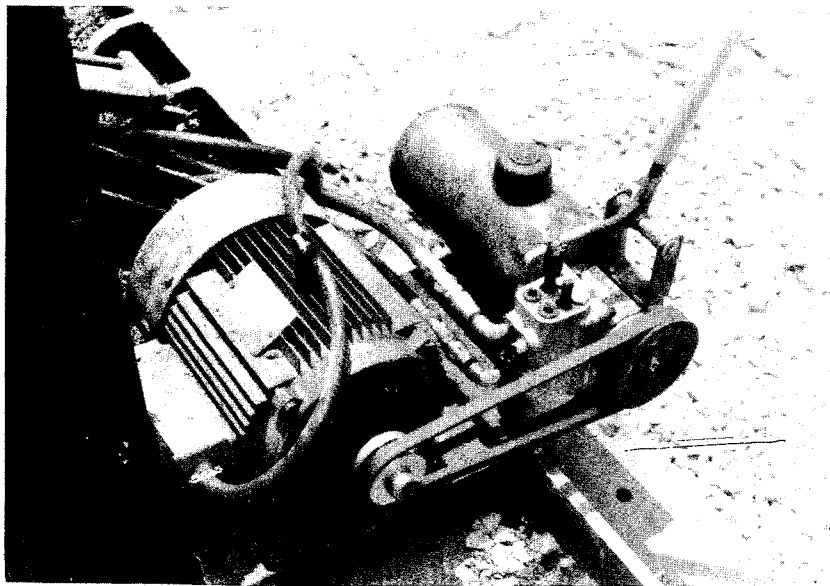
Hydraulic drive installed to improve the vertical steering of the head.
